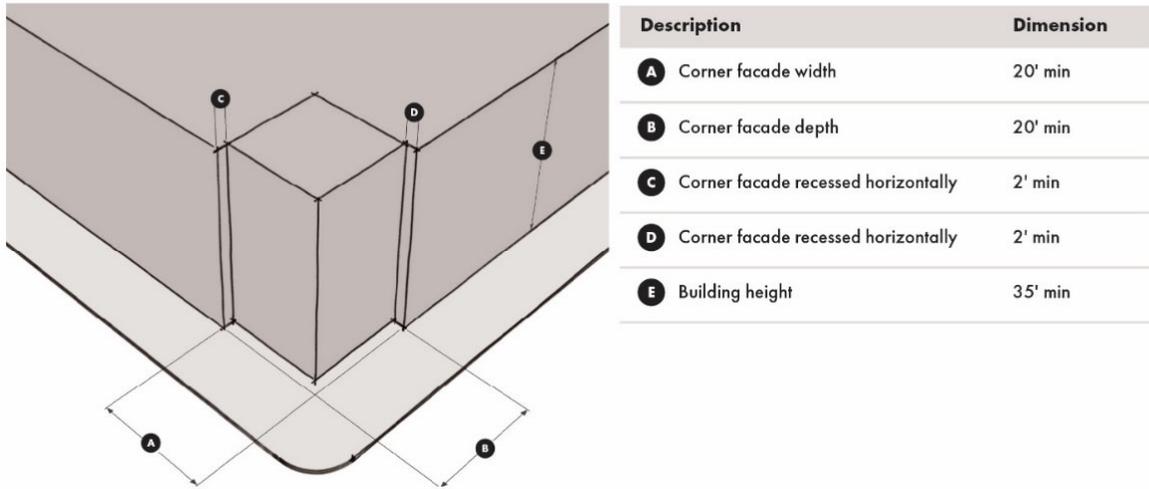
AA: Corner popped out from rest of façade.
